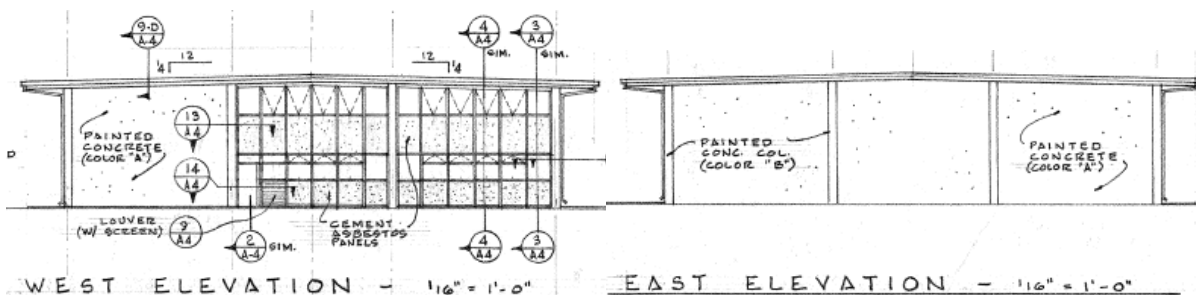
West and east elevations of 315 Bonair Siding Road, 1961. Prepared by CSPE. Source: Stanford University LBRE.
